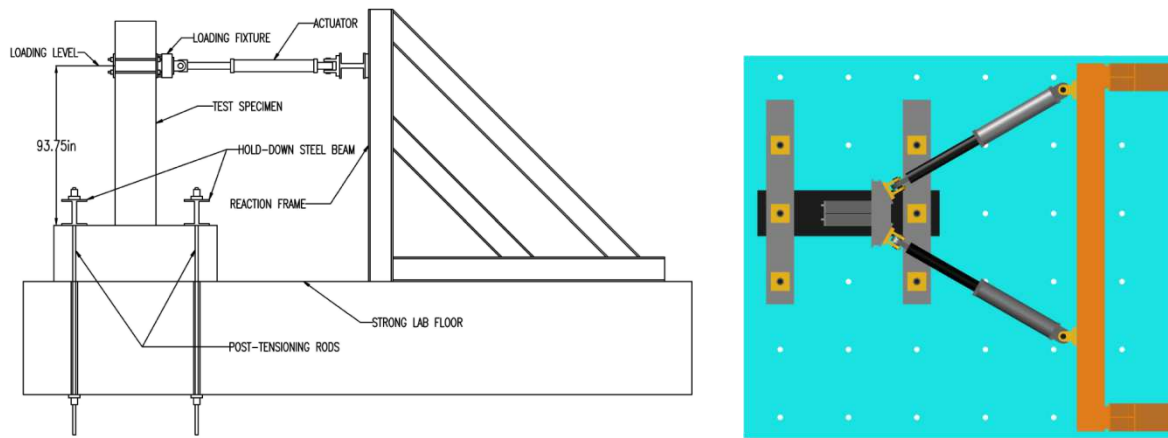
Schematic test setup – Left: Elevation View; Right: Plan View
